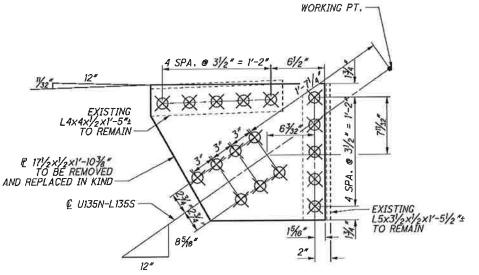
WEST CONNECTION ₽ WEST ELEVATION
